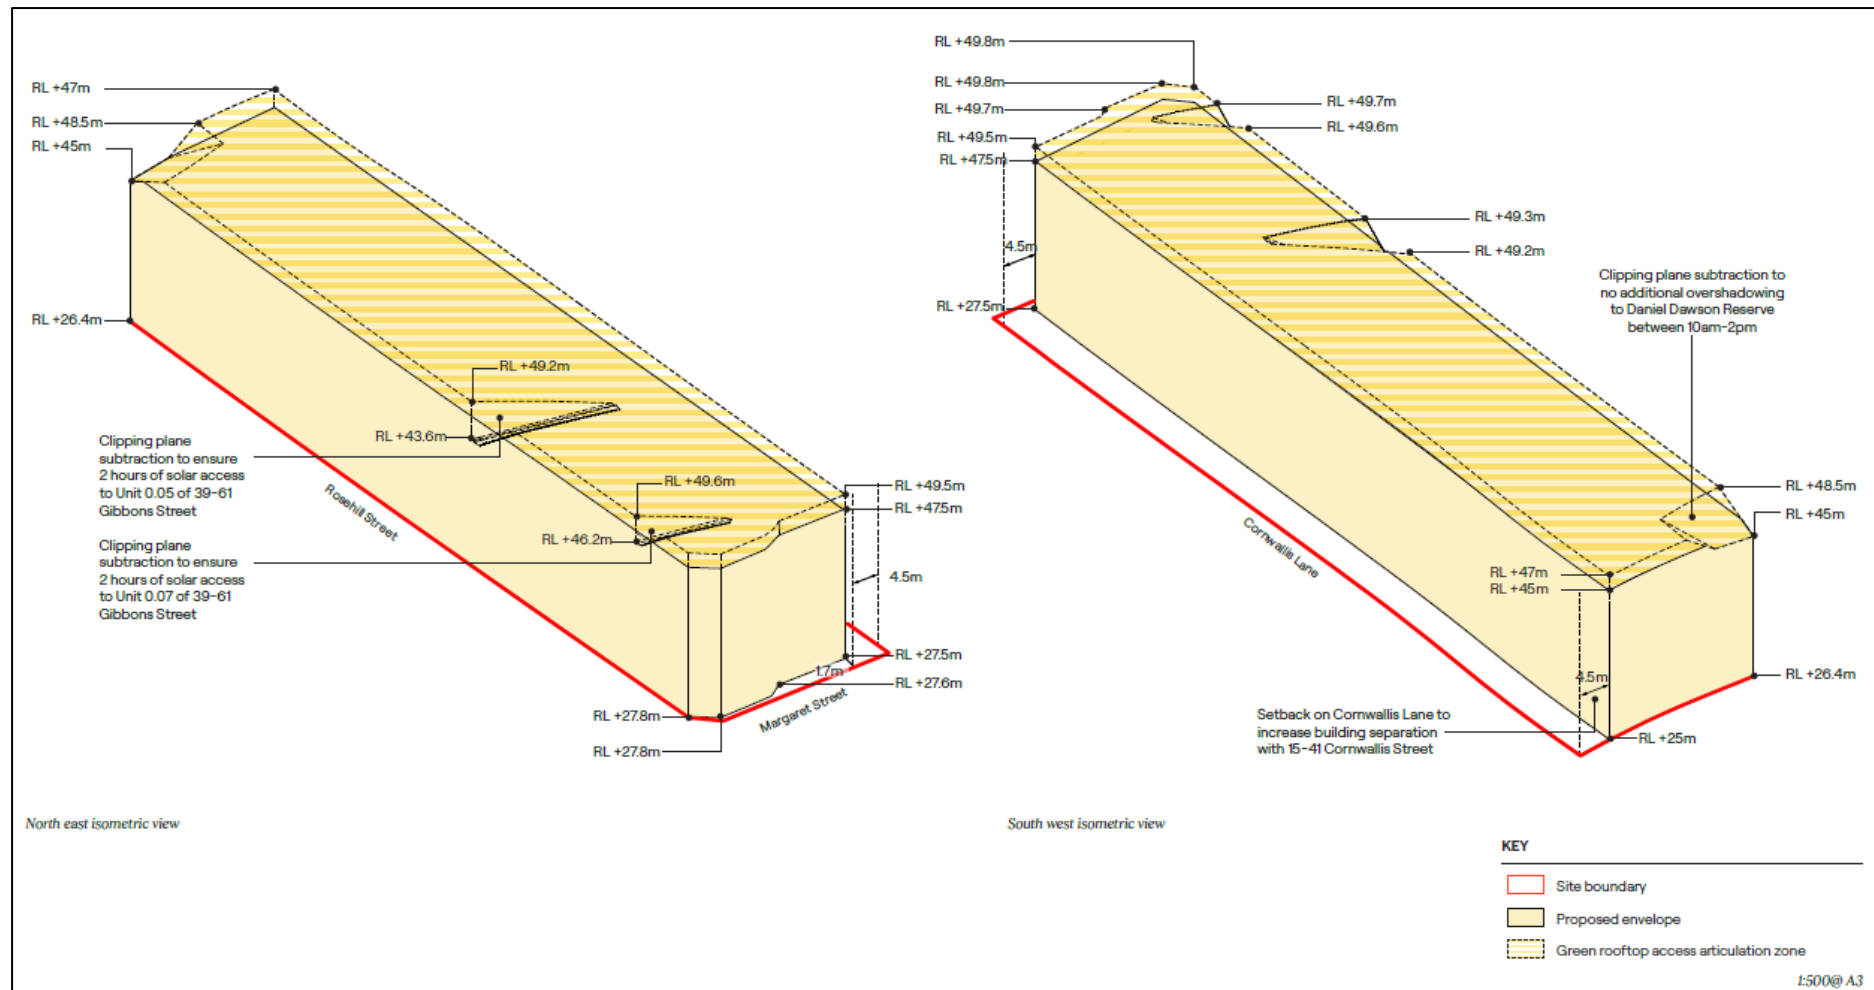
Building Envelope – 44-78 Rosehill Street, Sydney
